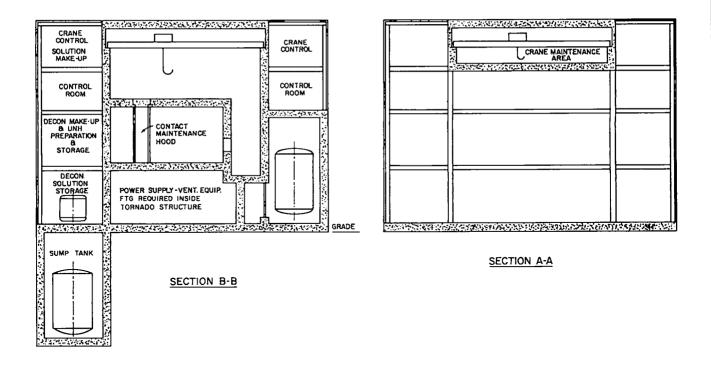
Coprecal facility layout, sections A-A, B-B.
